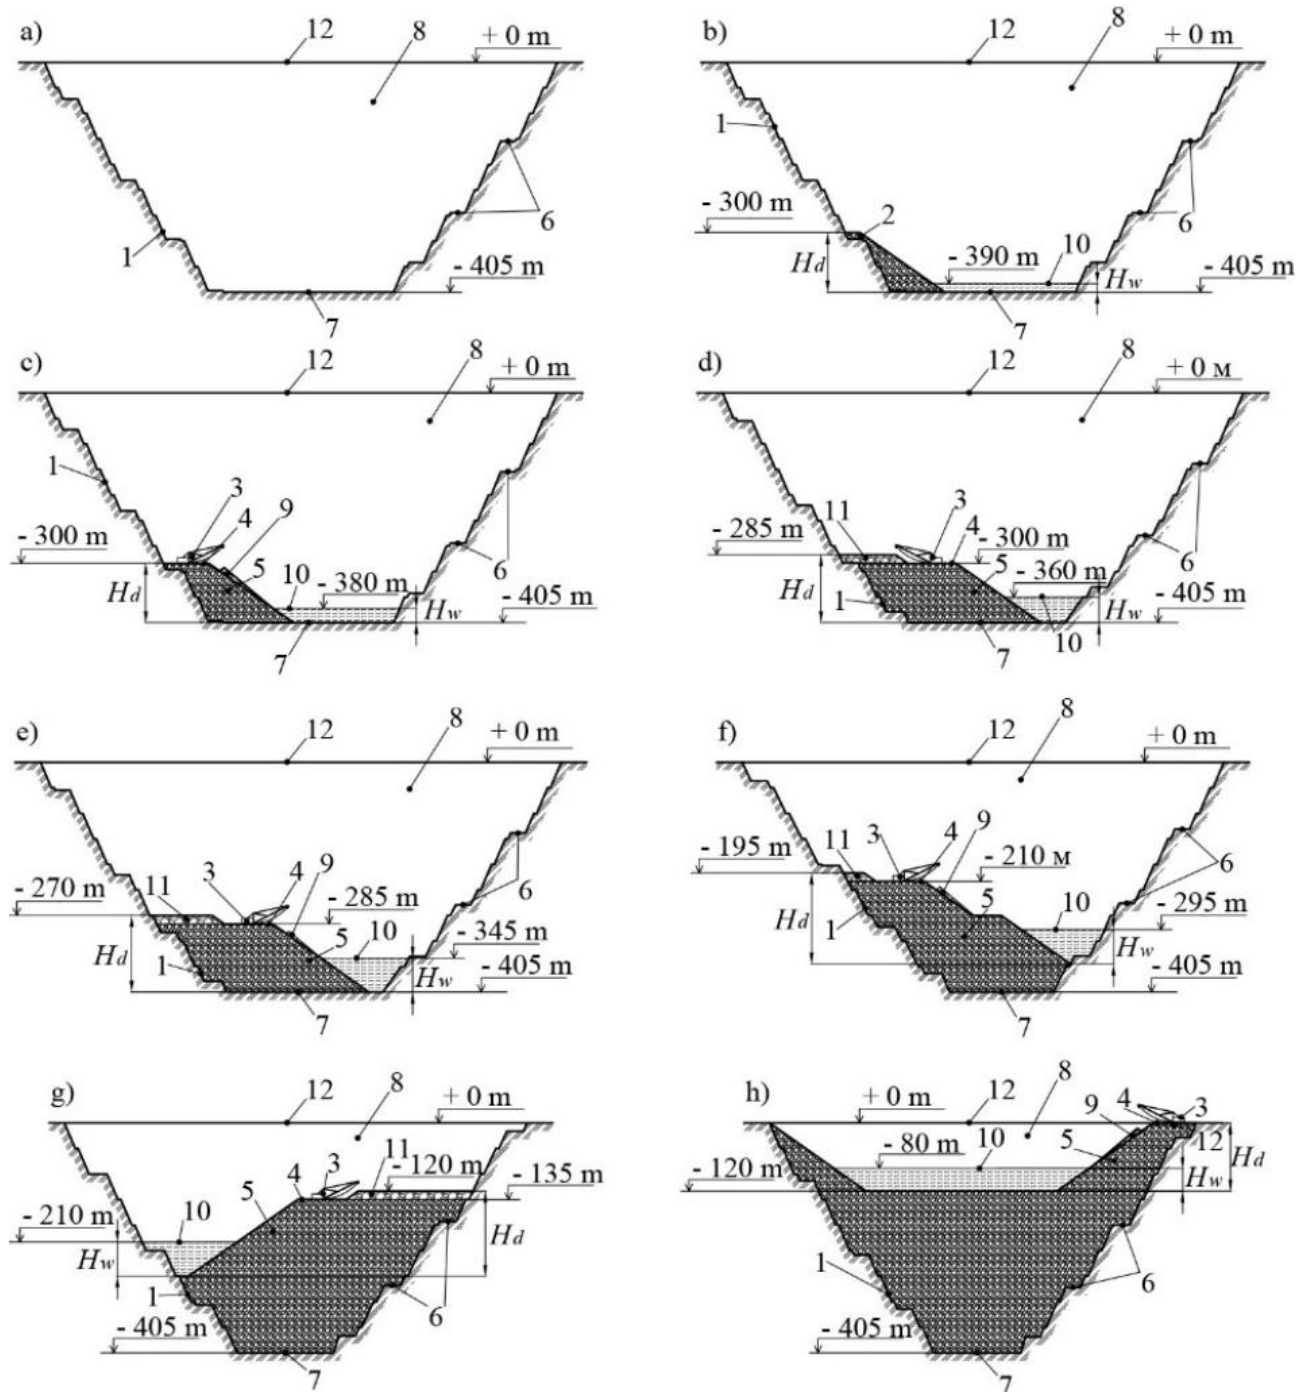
Deep open-cast mine reclamation scheme: 1 – side of the mine; 2 – pioneer dump; 3 – dragline excavator; 4 – prism of possible landslide; 5 – dump tier; 6 – transport berms; 7 – the bottom of the pit; 8 – developed intra-mine space; 9 – fallow back; 10 – height mark of the water level in the intra-mine space; 11 – the next tier; 12 – surface
